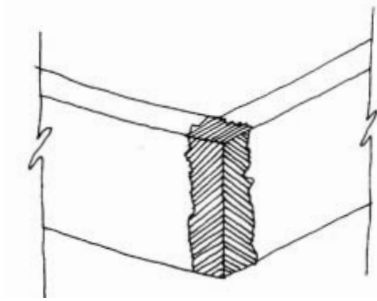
Diagram showing how vertical cracks at a corner can lead to instability of the corner section of the wall.
